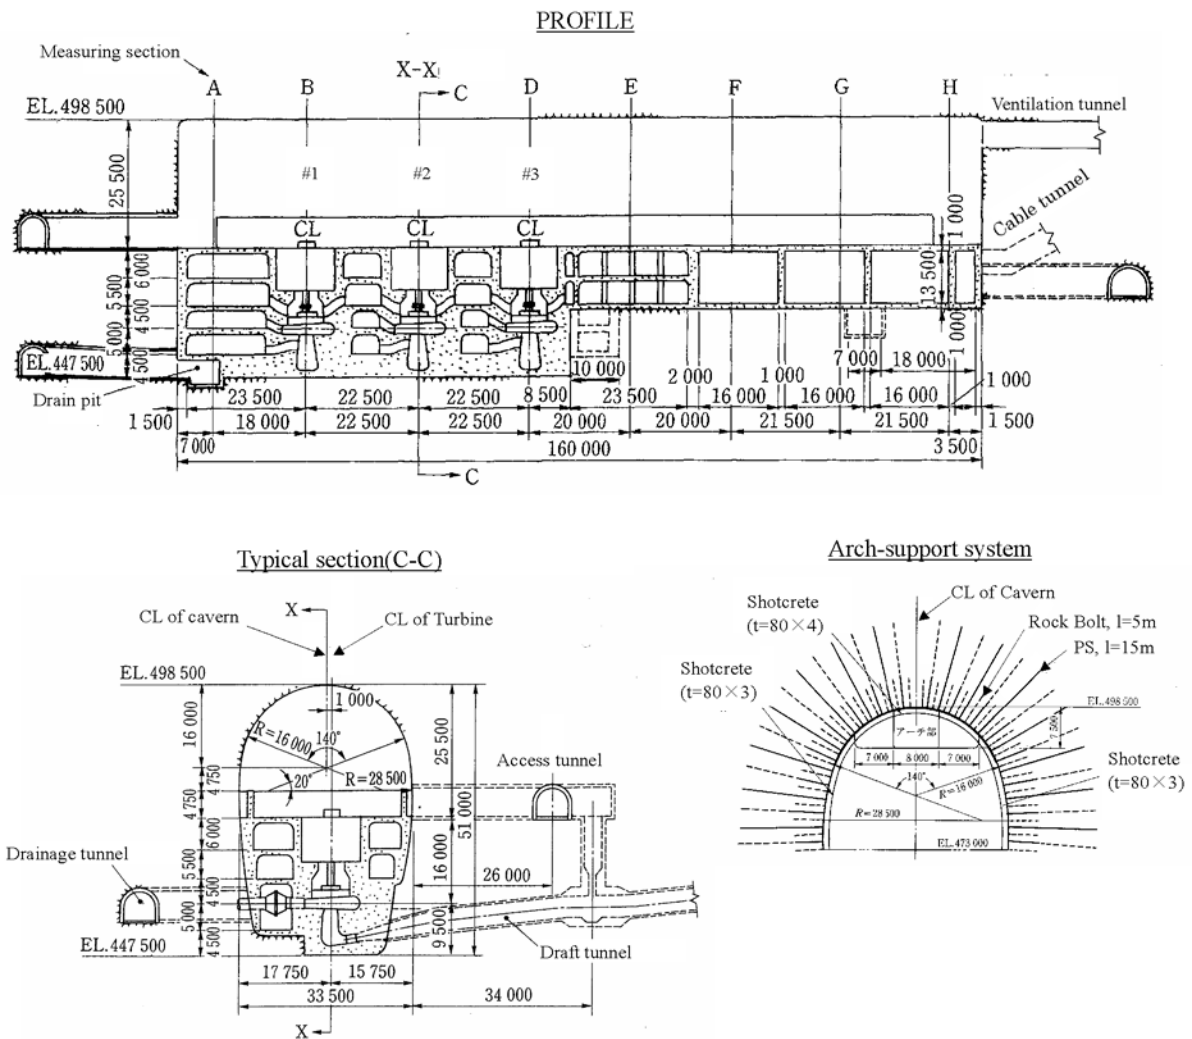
Example of Underground Powerhouse (Imaichi PS in Japan)
